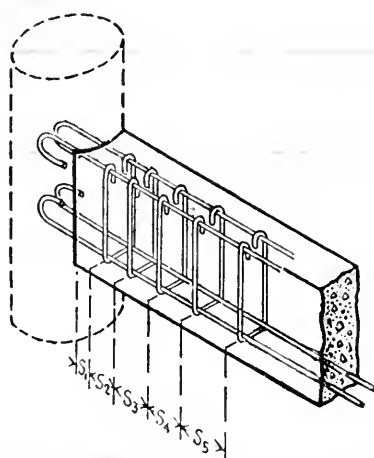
Typical Reinforced Concrete Beam with Anchored Longitudinal Bars and Vertical Stirrups
